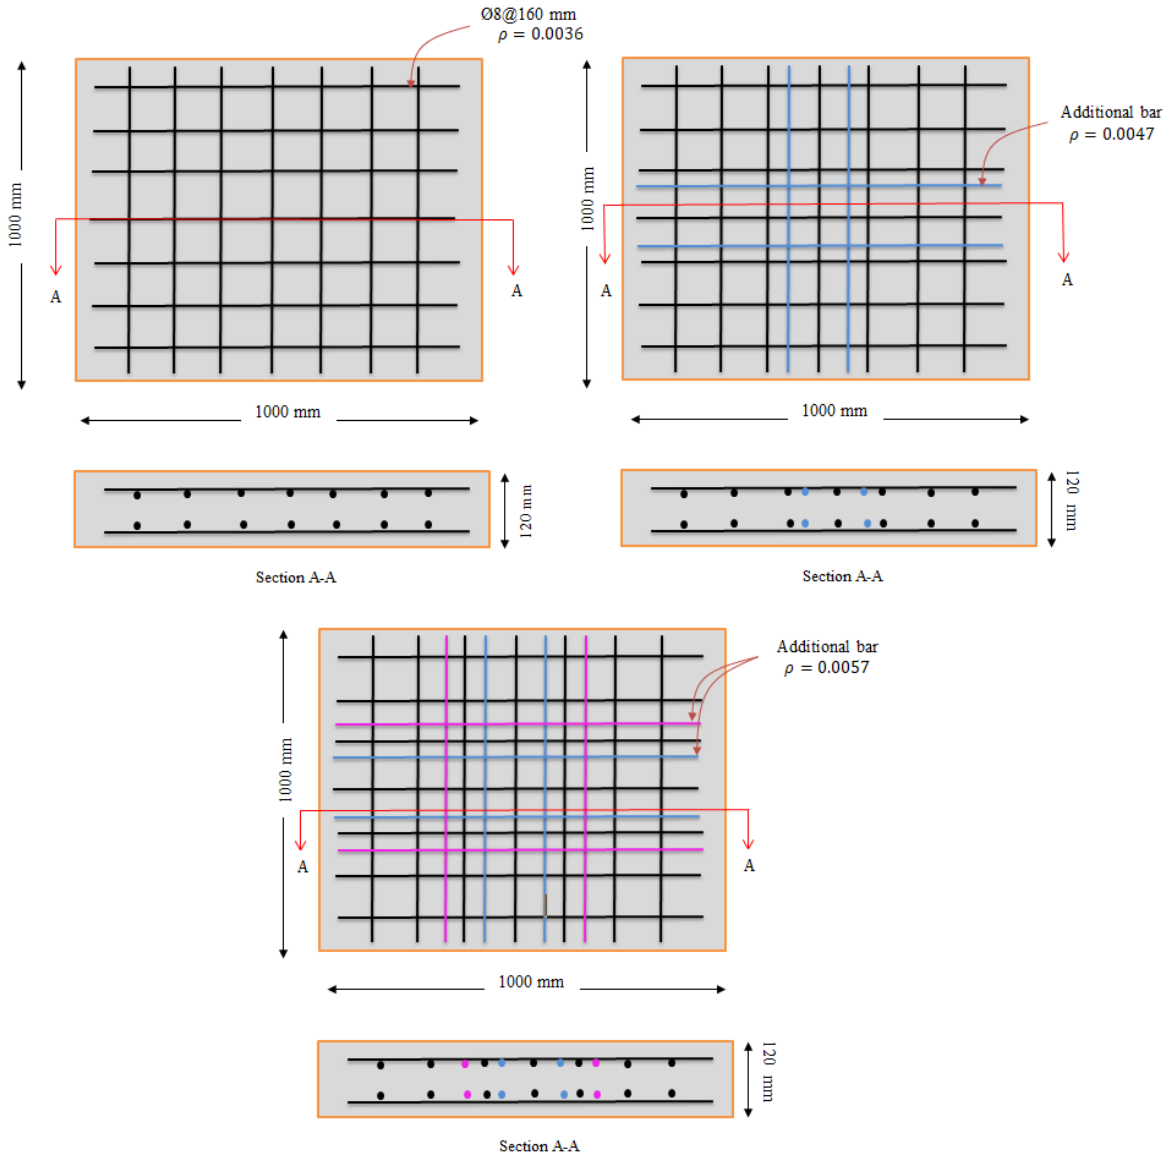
Dimensions and reinforcement layouts of the test specimens.
